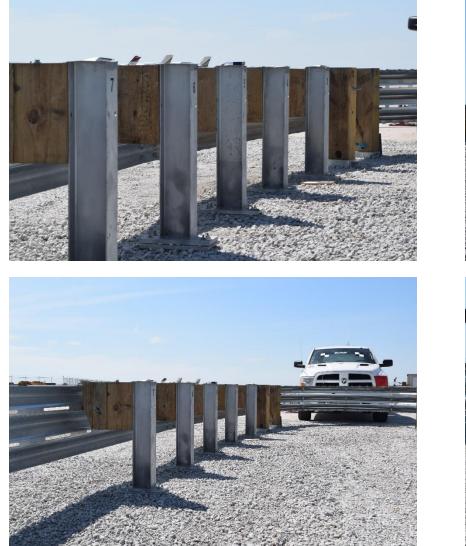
Test Installation Photographs, Post Details, MSPBN-6
